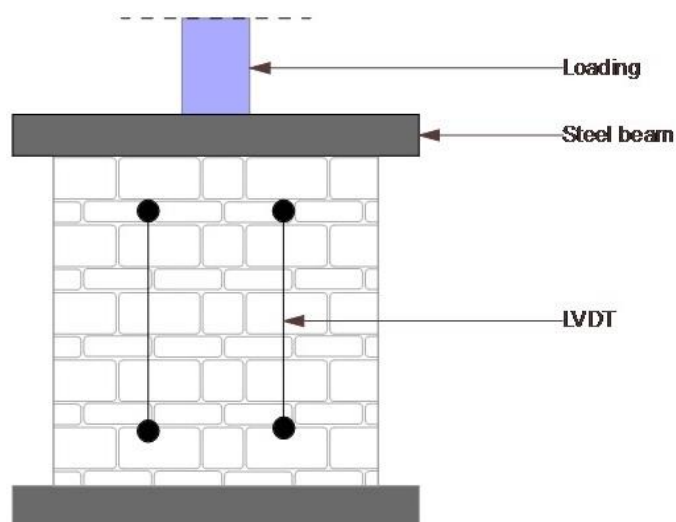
Typical arrangement of a uniaxial compression test of a masonry panel
